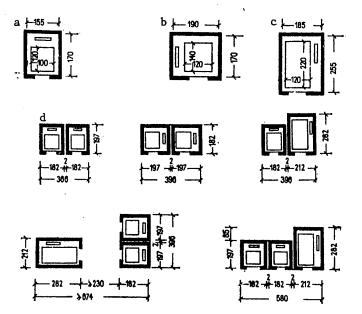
Types and sizes of elevators. a--320-kg passenger elevator; b--500-kg freight and passenger elevator; c--1,000-kg freight elevator; d--versions of elevator blocking.
